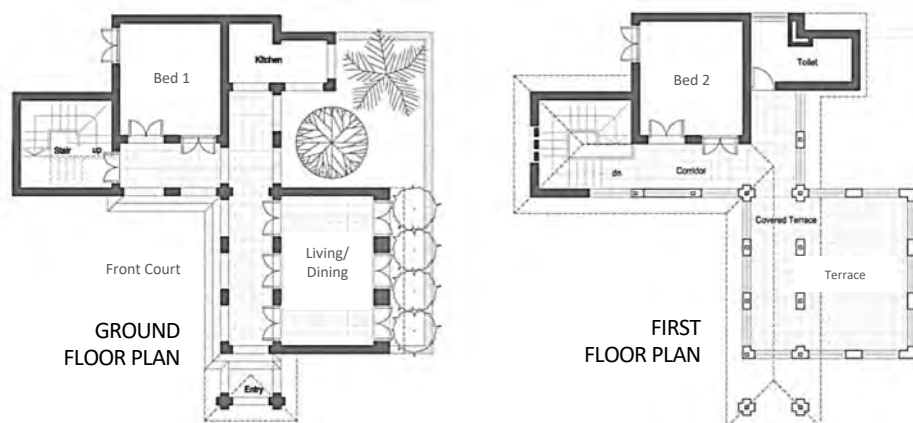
Ground floor plan and first floor plan of Bhatshala Complex
